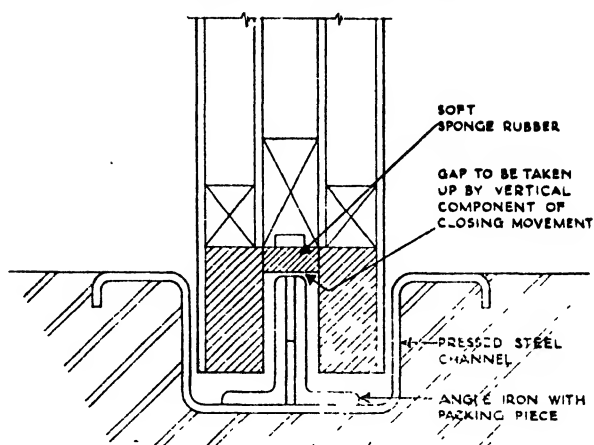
SEAL TO SILL OF SLIDING DOOR
